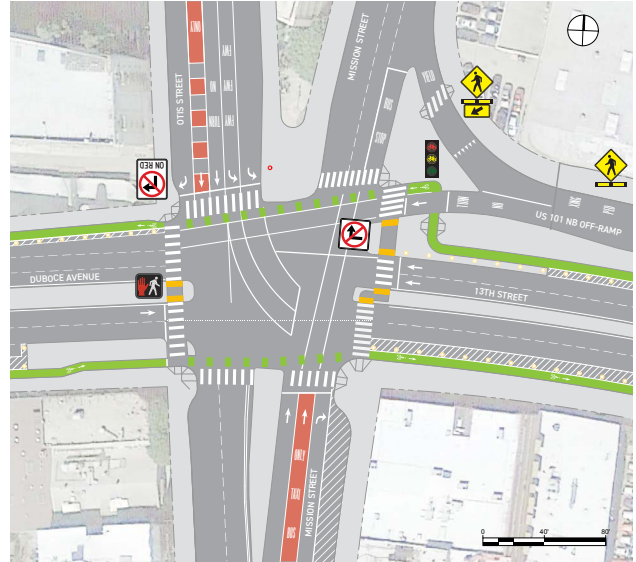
Mission, Otis, Duboce, 13th Street Improvement Plan (Option 2)
